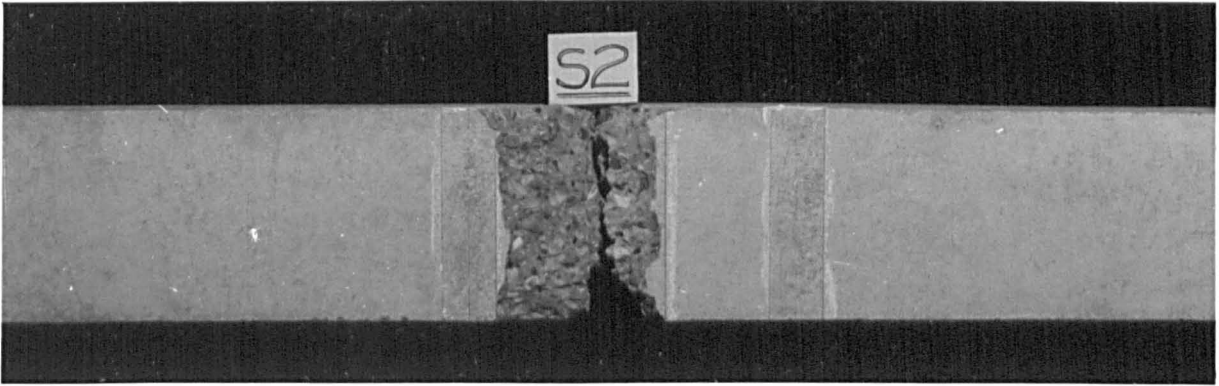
The Compressive Surface of Slab Strip S2 After Test
